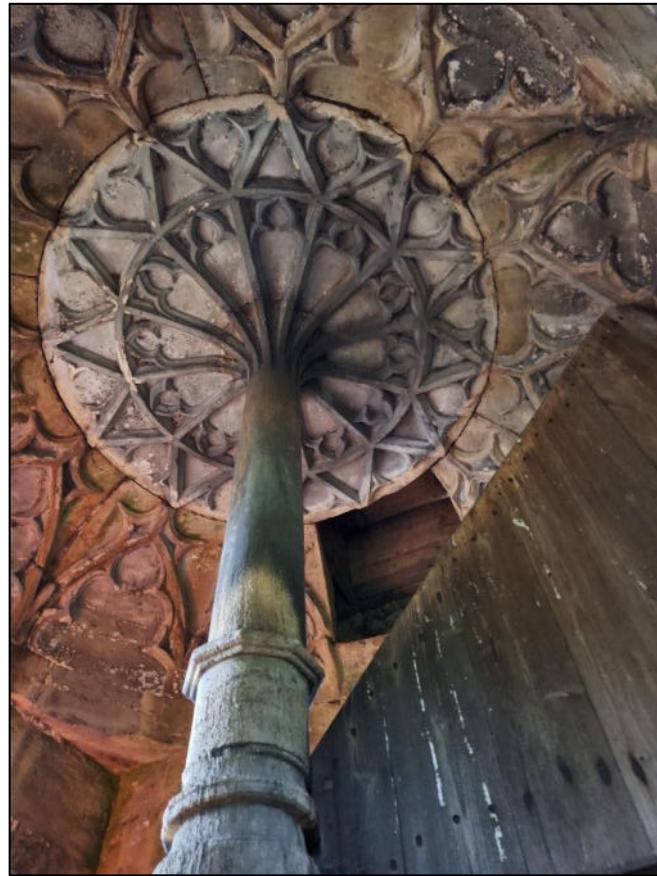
Internal decorative collar and supporting column for vaulted ceiling of tower.
